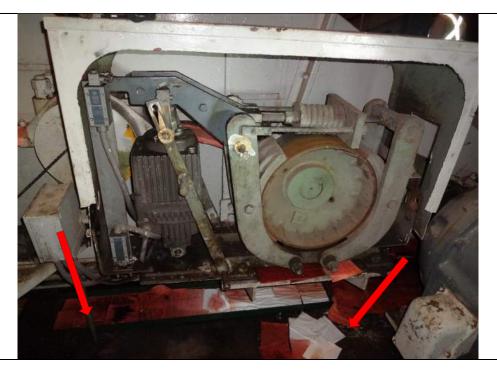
[South Machinery Room] - Oil leaks outside of central gear boxes and is soaked up by using copious amounts of rags.
